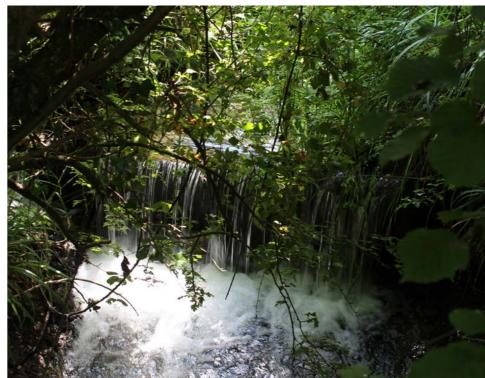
Photograph B. Curved brick wall structure, with flow focused to the centre holding the Honeybridge Stream, upstream of that culverted under the western end of The Pike, east of London Road.
